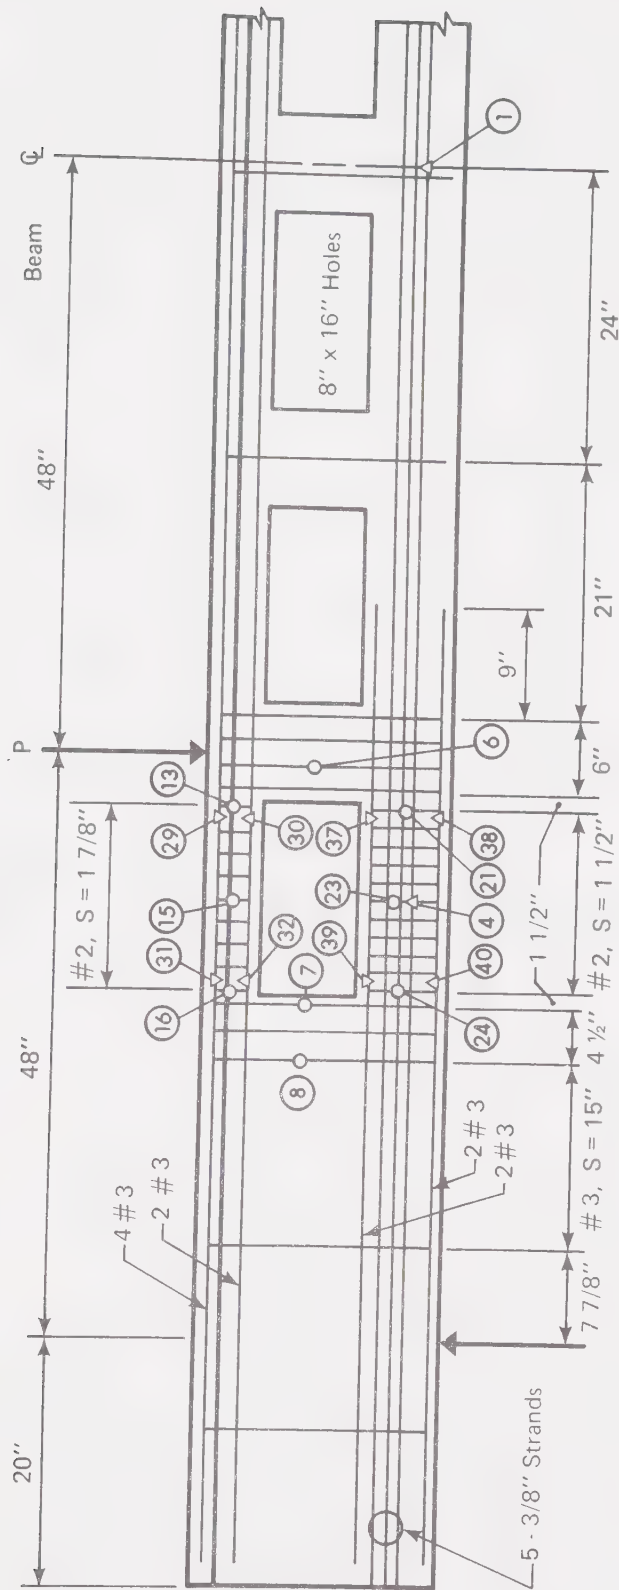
Reinforcement Details and Strain Gage Locations for Beam 17-16-4
